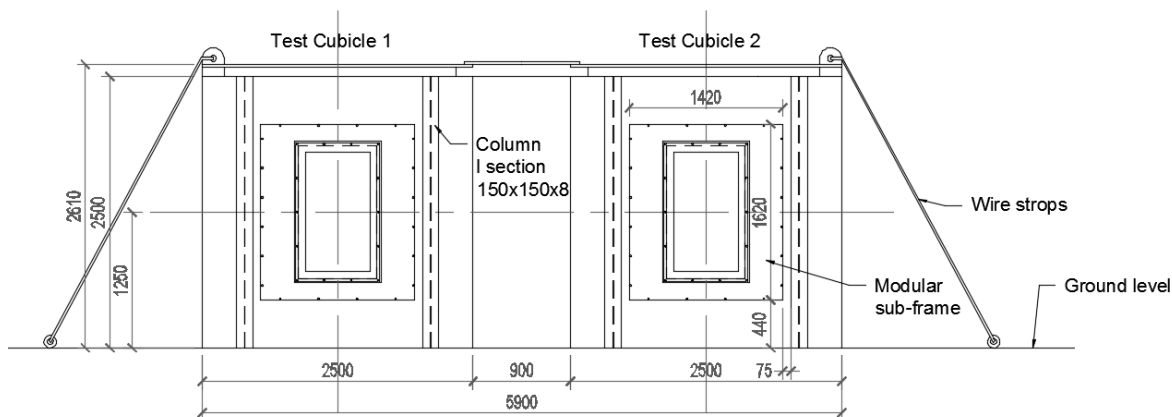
Front elevation of test cubicles. View towards ABT RWE.
